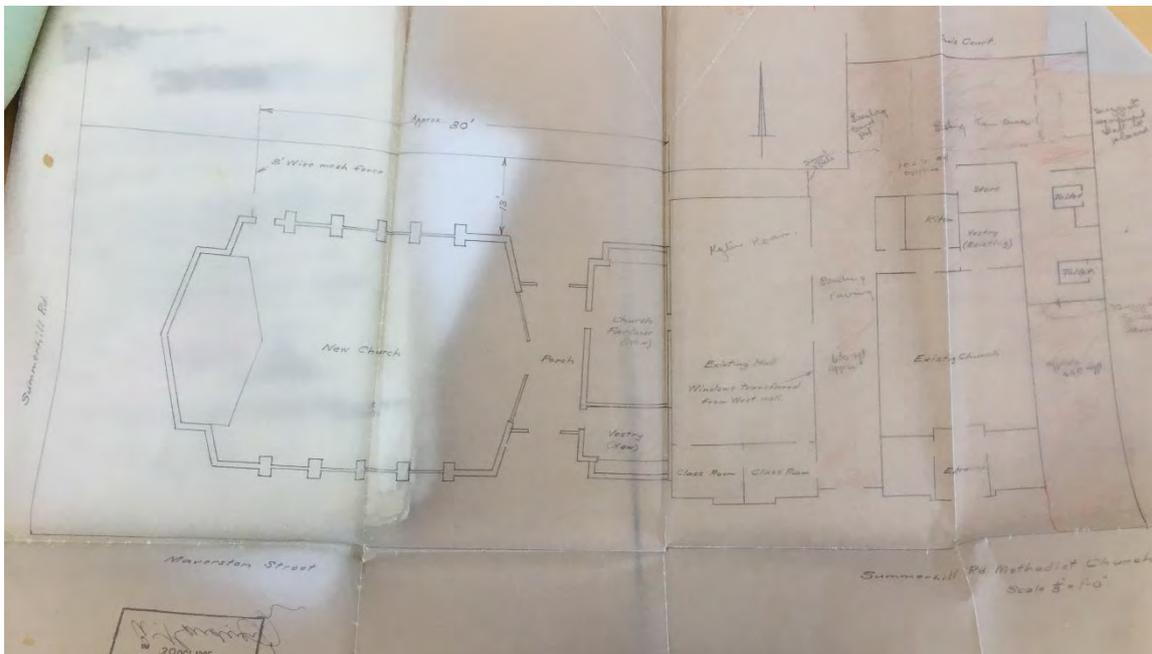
Site plan of the church complex c1965. (Source: Public Records Office of Victoria)
